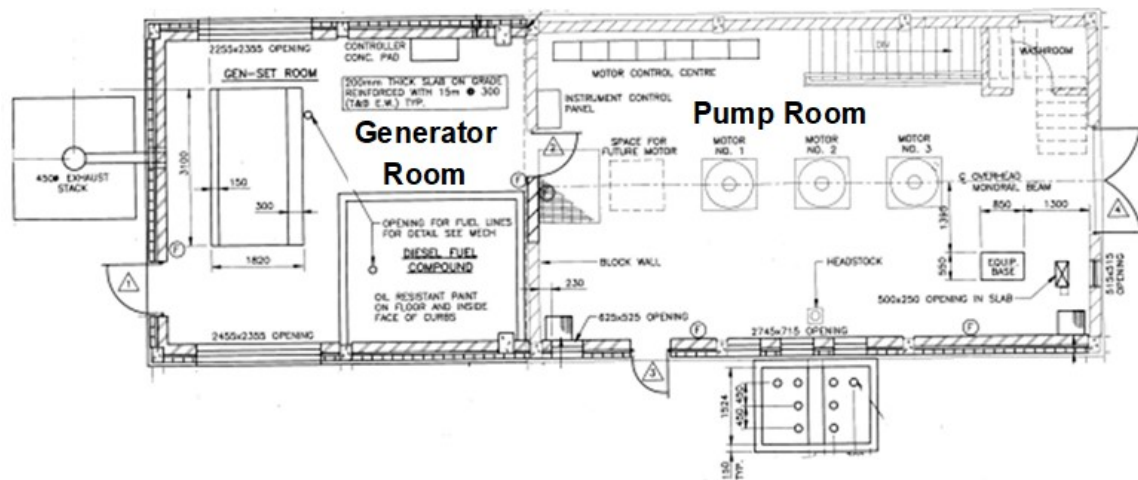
Spring Valley SPS Main Floor Plan (Associated Engineering, 1994)
